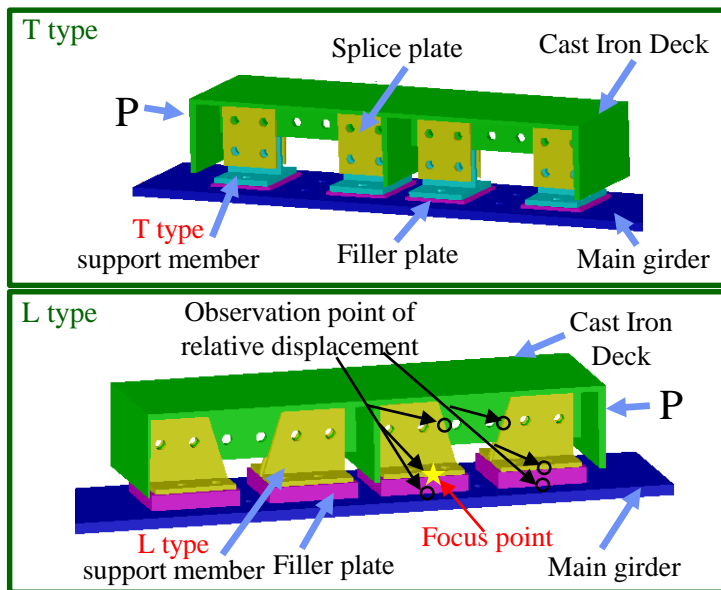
A Connected Example of Cast Iron Slab Module and a main girder
